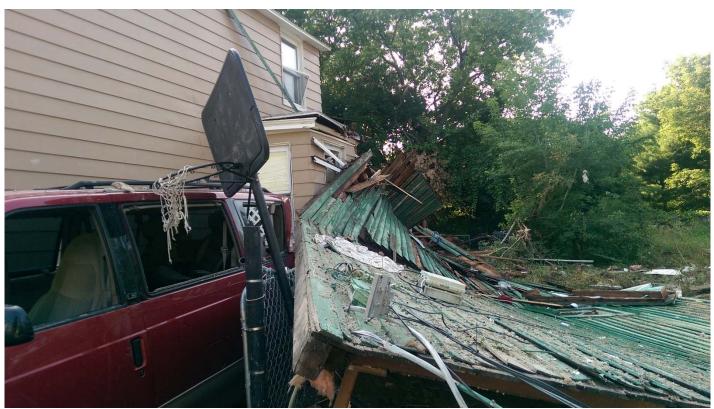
(8/10/2014) - 314 Paige Street exterior damage.
